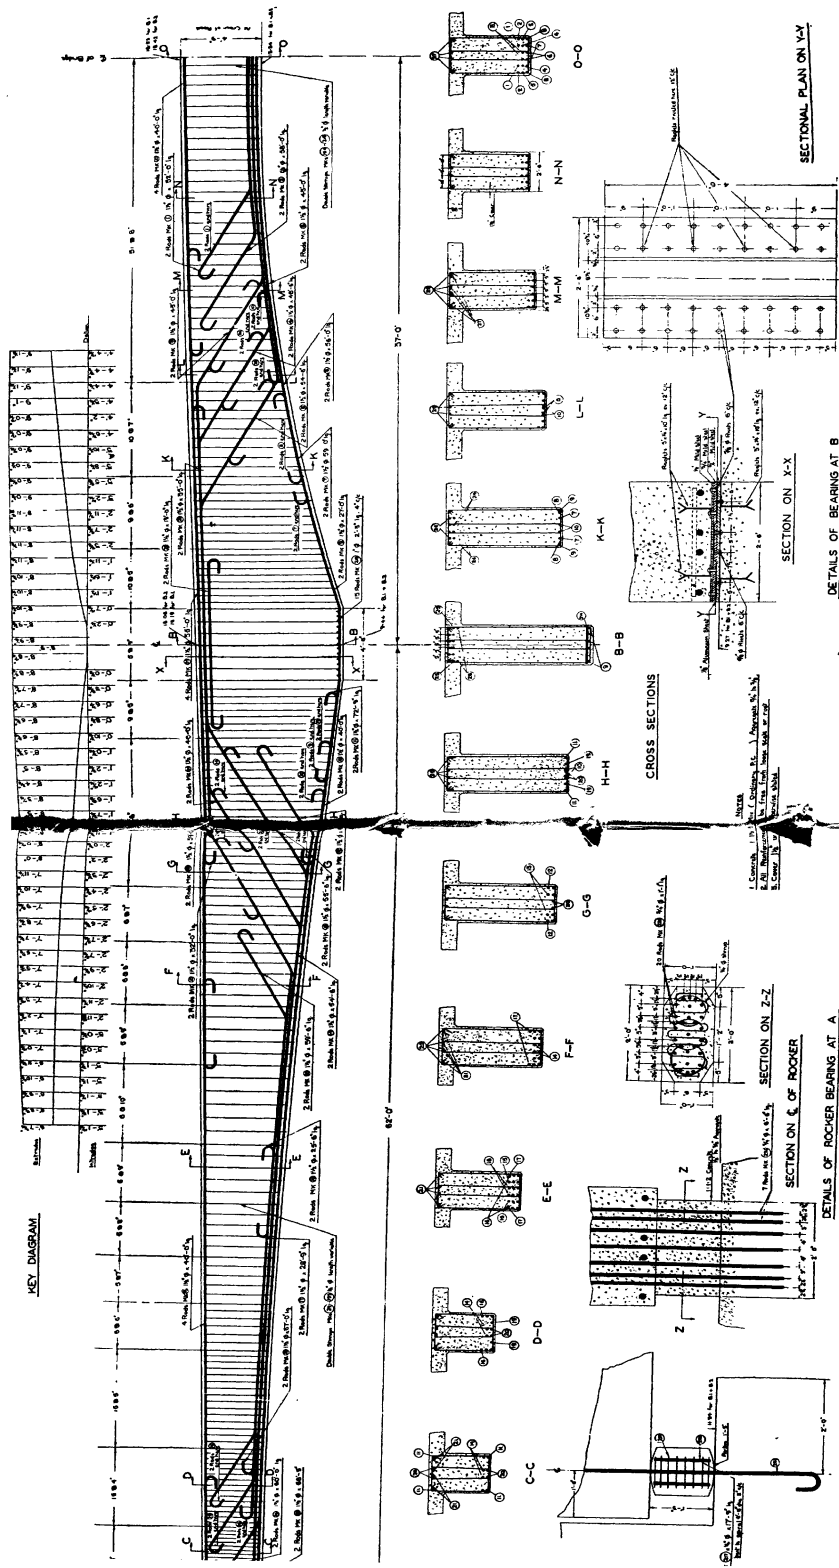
RECONSTRUCTION OF WICK SERVICE BRIDGE.
